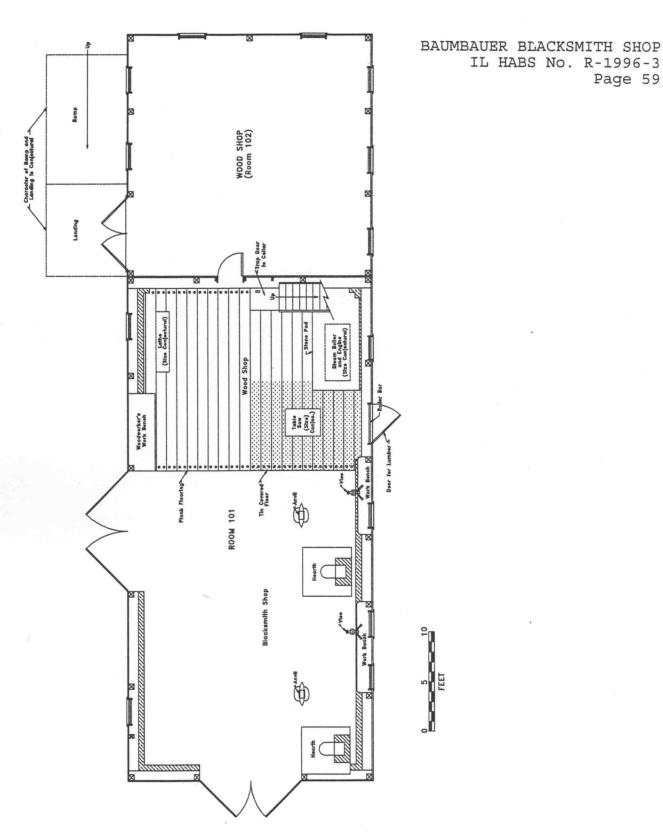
Ground floor plan of the Baumbauer Blacksmith Shop, showing construction of the north addition, ca. 1885.
